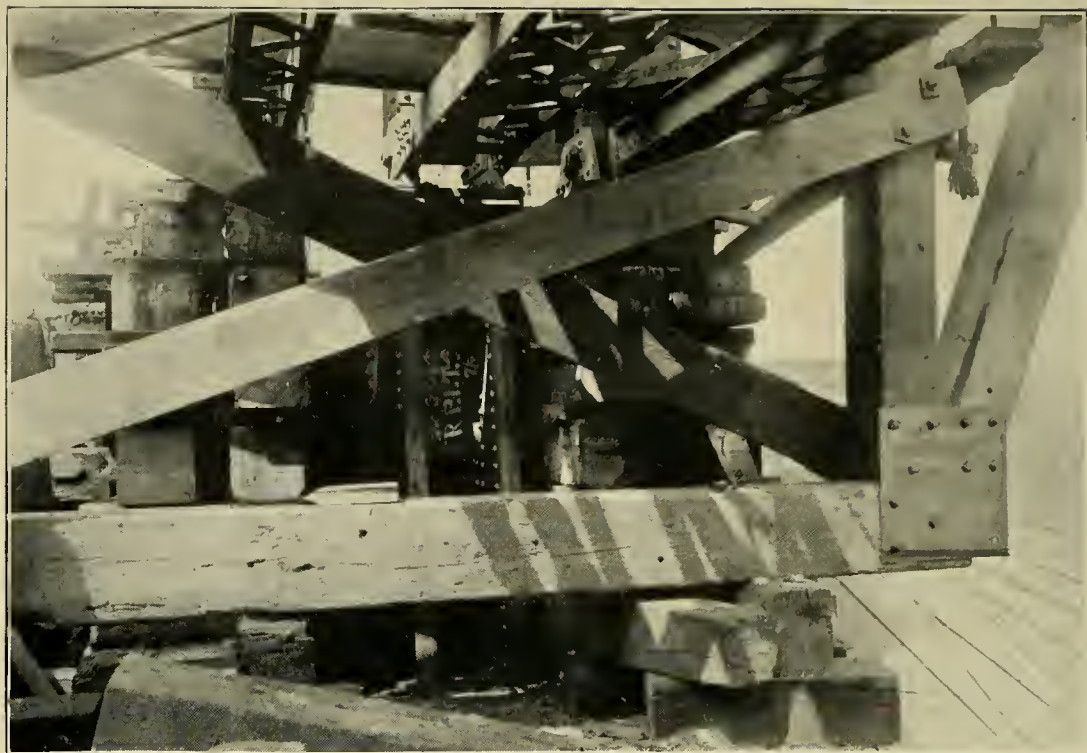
PERMANENT STEEL PEDESTAL SUPPORT FOR CENTER TRUSS.
